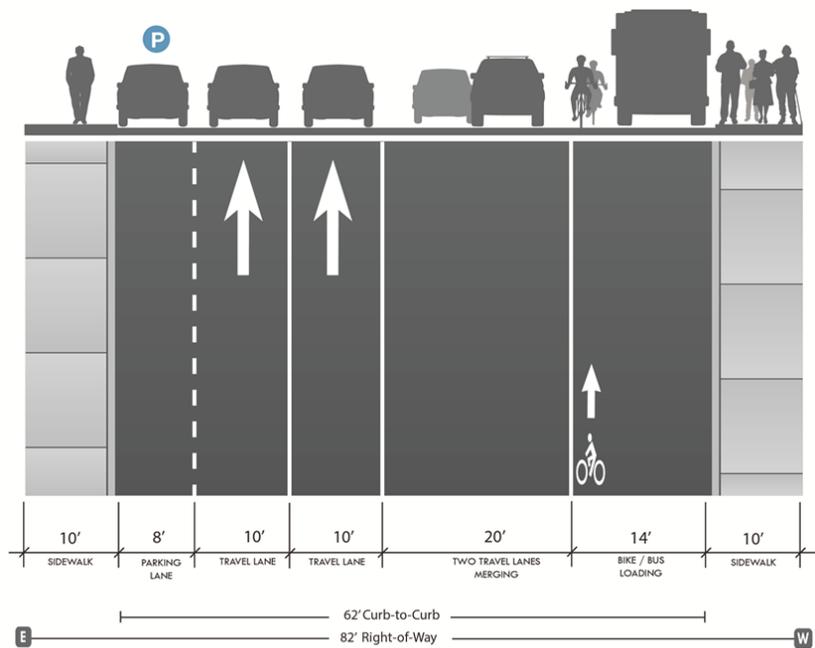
8TH STREET AT MARKET STREET, FACING SOUTH – EXISTING ALIGNMENT
